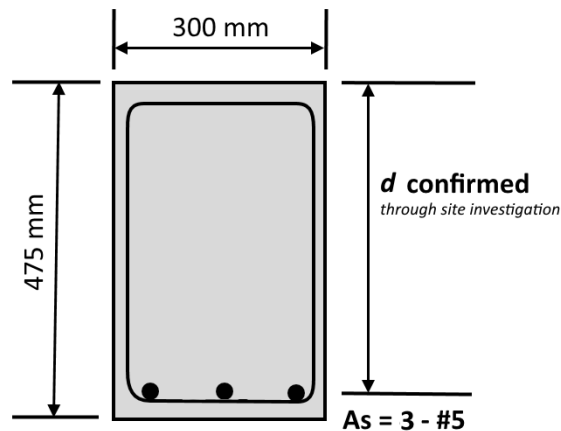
Case Study III: As-Built - Cross Section Schematic of Beam Element
